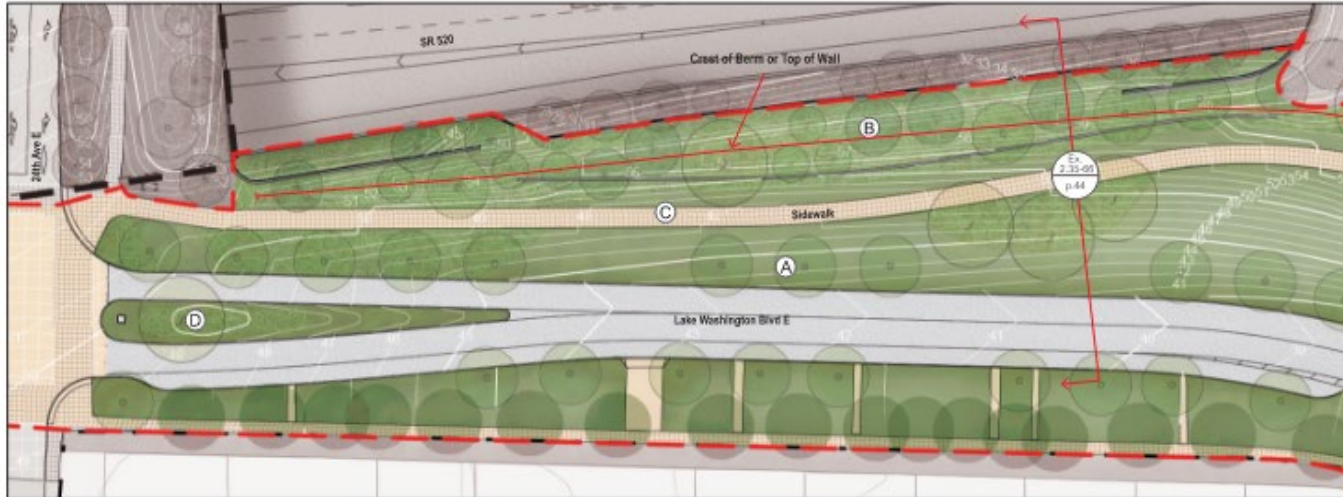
E Lake Washington Blvd east of 24th detail plan
